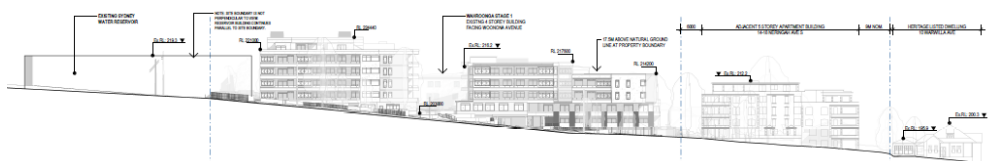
Proposed site elevation – Neringah Avenue South. (Source: Bickerton Masters Architects)
